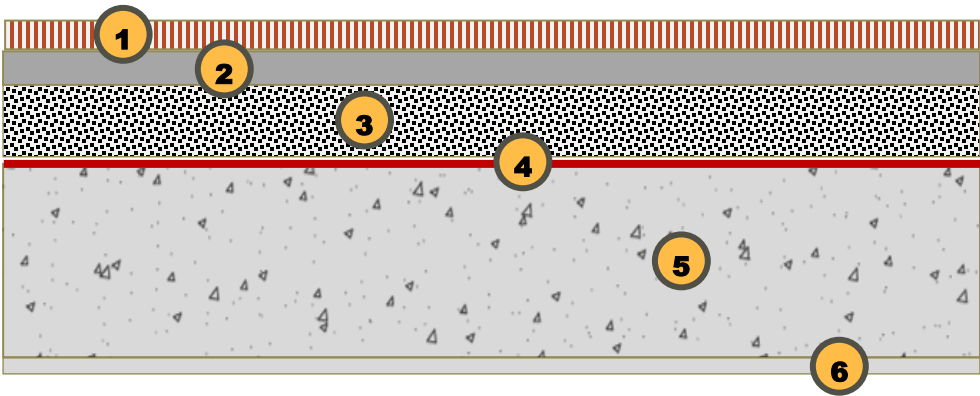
Construction detail for roof assembly: RCC slab with foam concrete insulation
